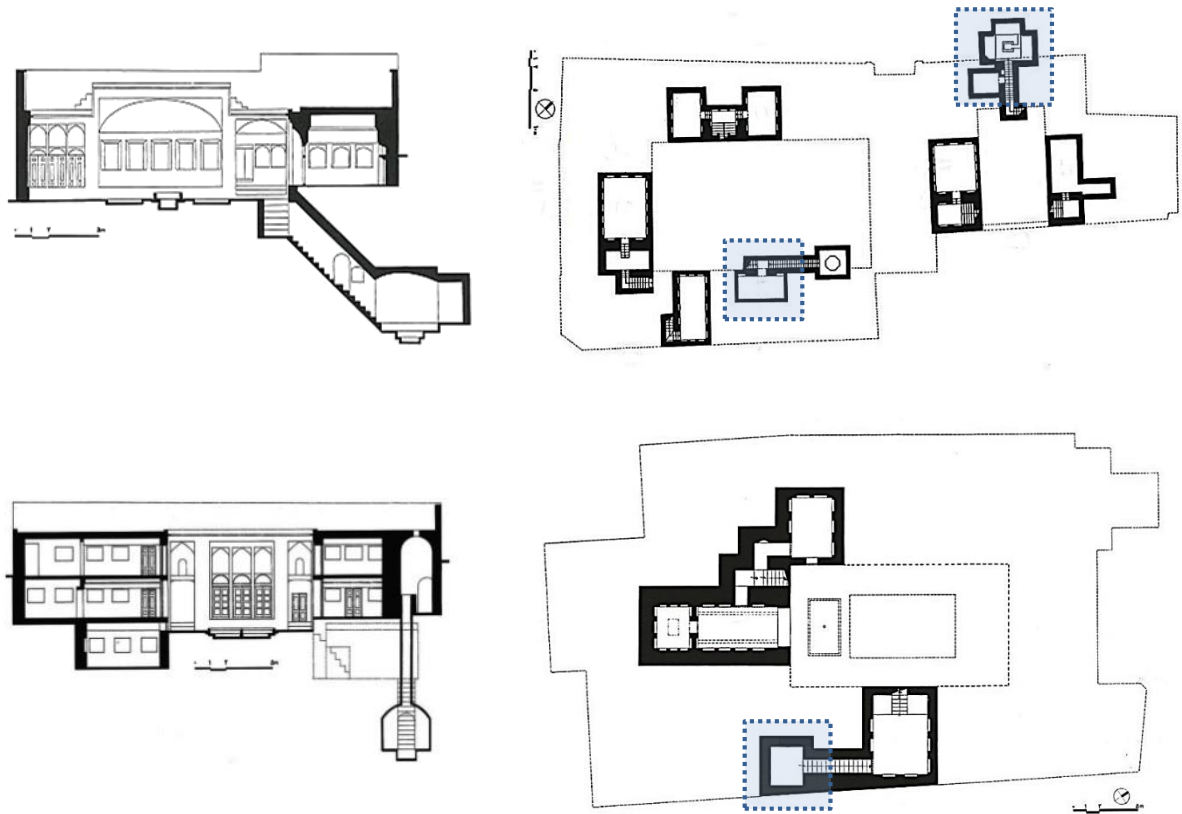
Payab and basement plan and section, up: Lari house, down: Tehrani house, Plans and sections' drawings are in different scales, base drawings from (Haji-Qassemi, Harirchi and Qelichkhani 2005)
